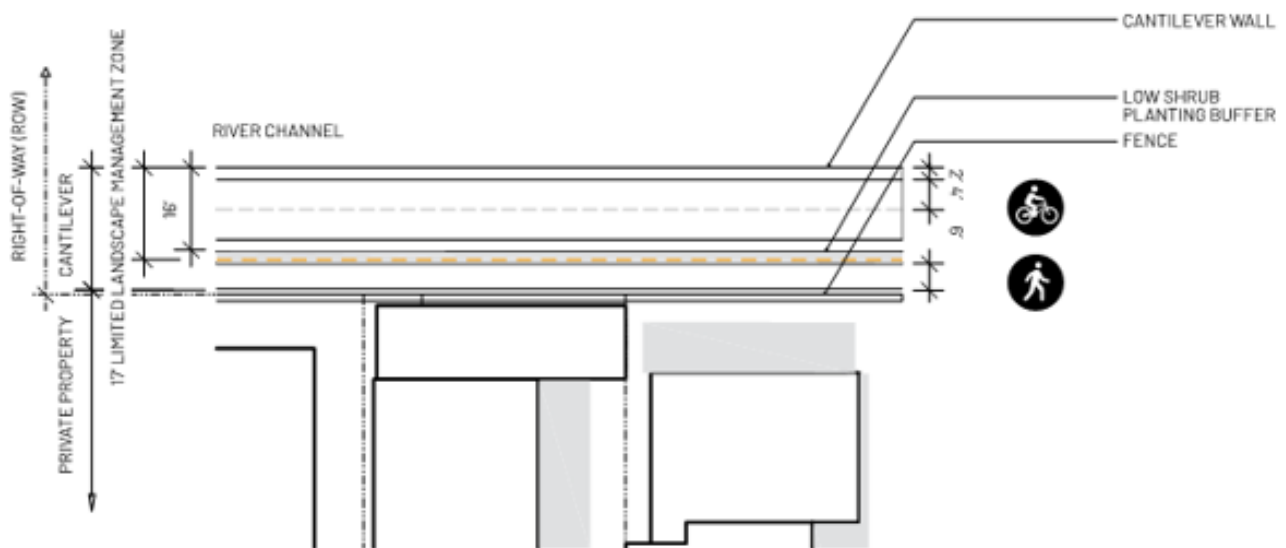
Example Cantilever Greenway Plan View (NTS)
